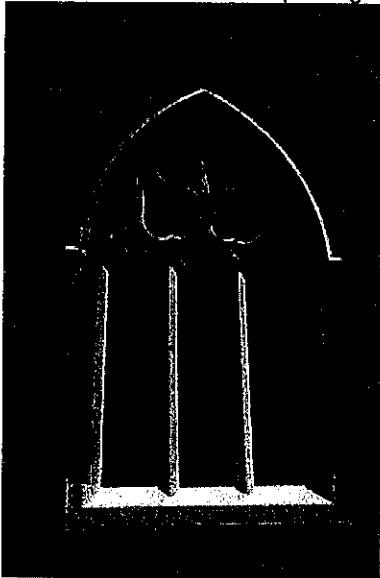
Exterior, east elevation. Detail of the recently-restored chancel window.
